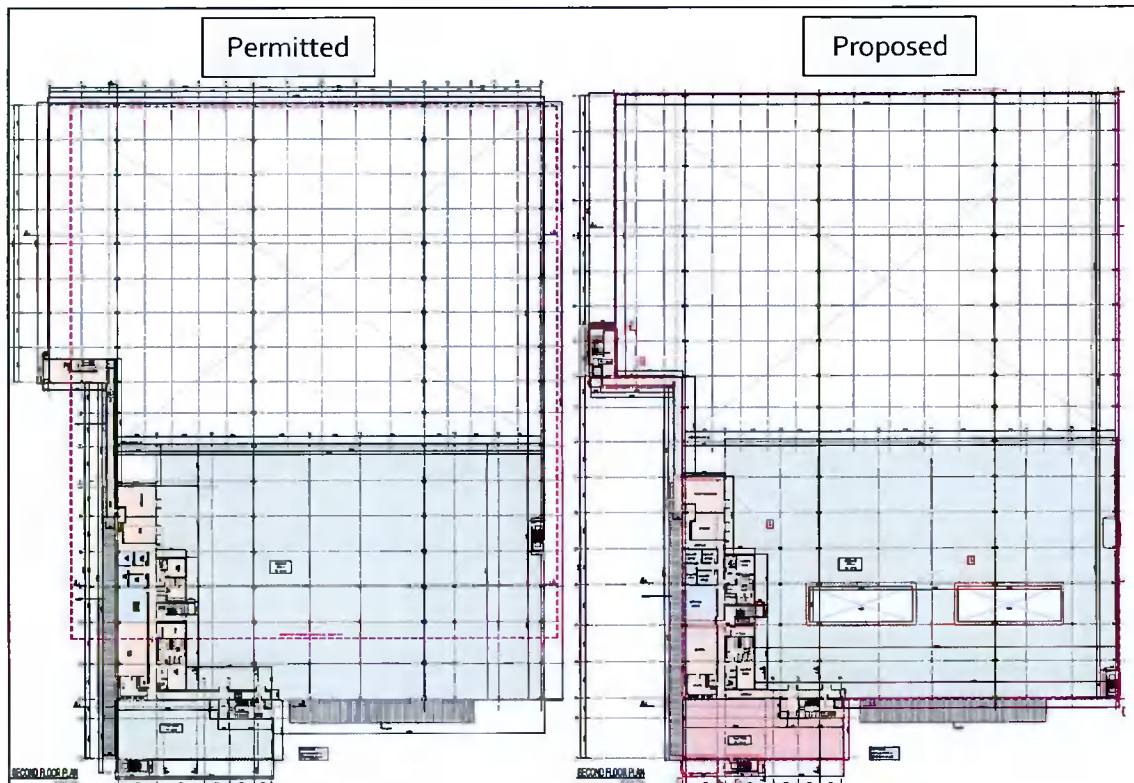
Permitted (SD21A/0200) and Proposed Second Floor Plans
